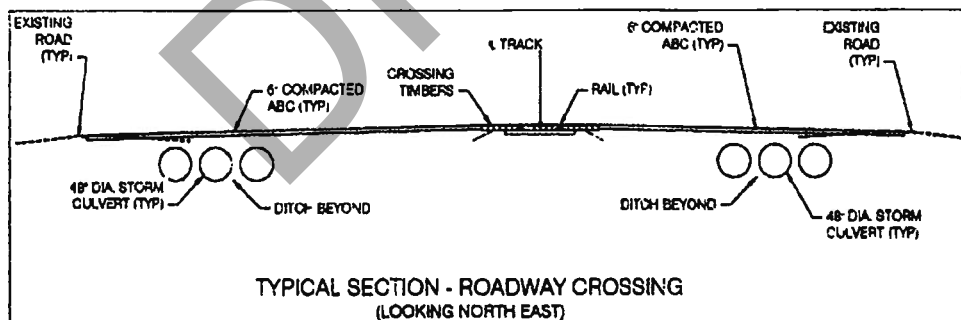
Typical cross section, looking side-long at the rail, for rail corridor areas including 48 inch culverts.
